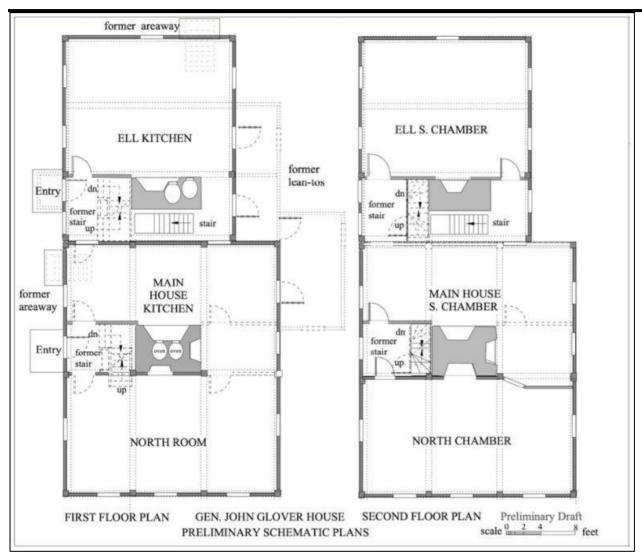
Current plan of the building; the north elevation is at the bottom of the image. This plan depicts the original main and ell entrances depicted in figure one but not the current main entrance at the bottom of the image opening into the "north room." (Plan prepared by Frederick C. Detwiller, "Gen. Glover Farm, Swampscott, Massachusetts, Architectural-Historical Preliminary Evaluation," prepared for the Swampscott Historical Commission, 4/26/2023.
